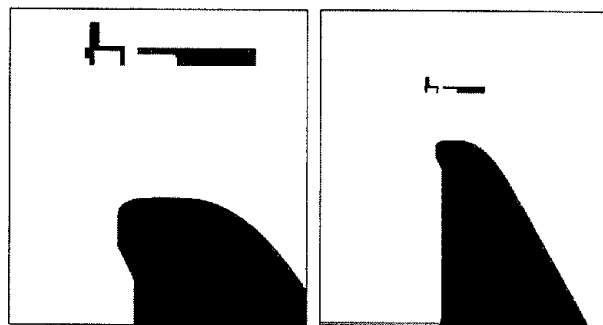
2D geometry model of the Hume Dam spillway. Zoomed-in details of parapet wall, drop gate gap and crest bridge shown on the right.
